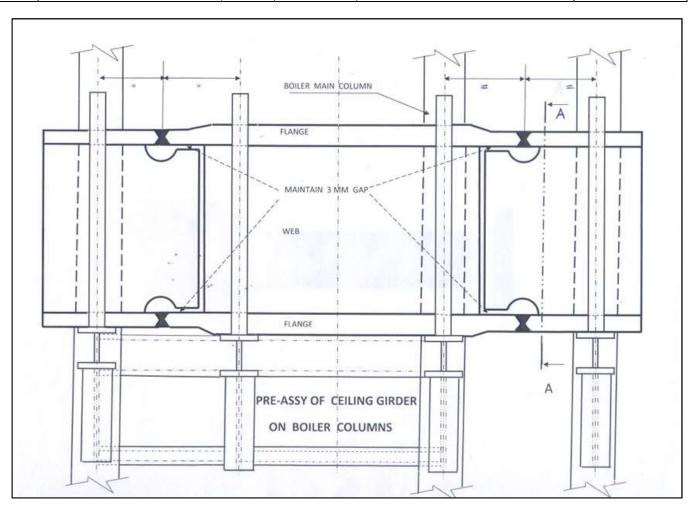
PRE-ASSEMBLY OF CEILING GIRDER ON BOILER COLUMNS
